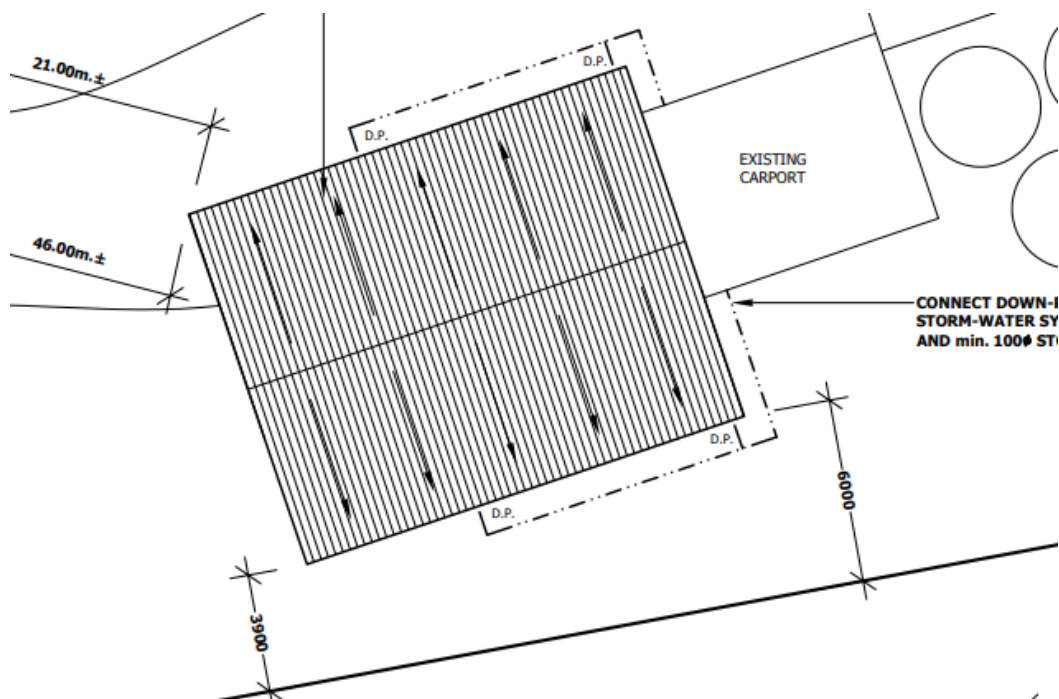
A part of the Site Plan showing the setbacks to the side boundary.
